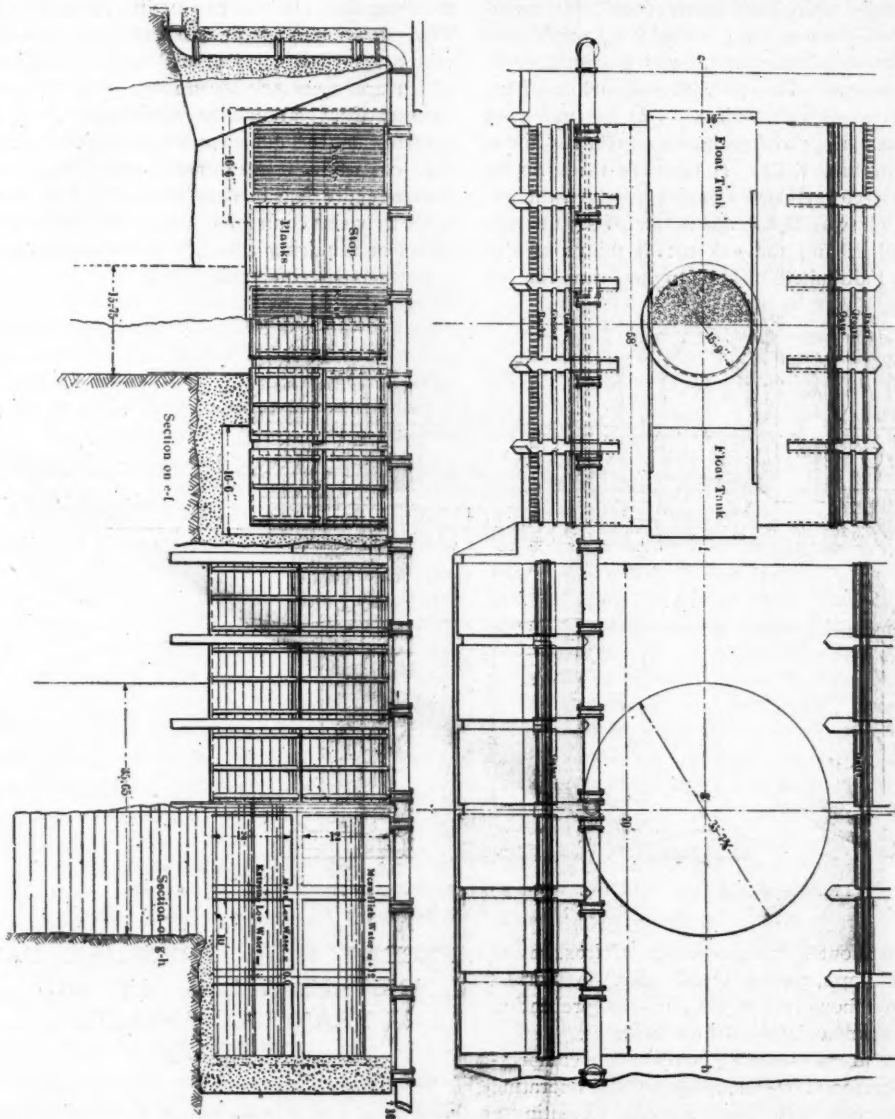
DETAILS OF INLET AND OUTLET TUBES, TANKS, ETC.
